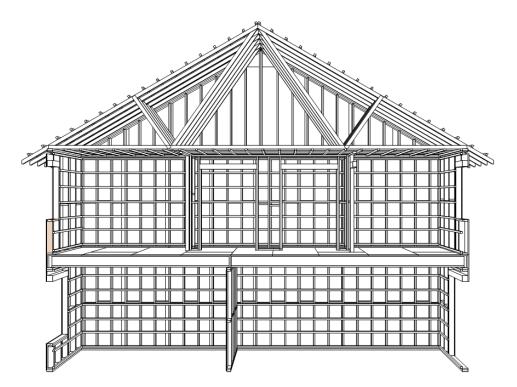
BIM model of existing Cygnum semi-detached house timber framing (Walsh 2022)
